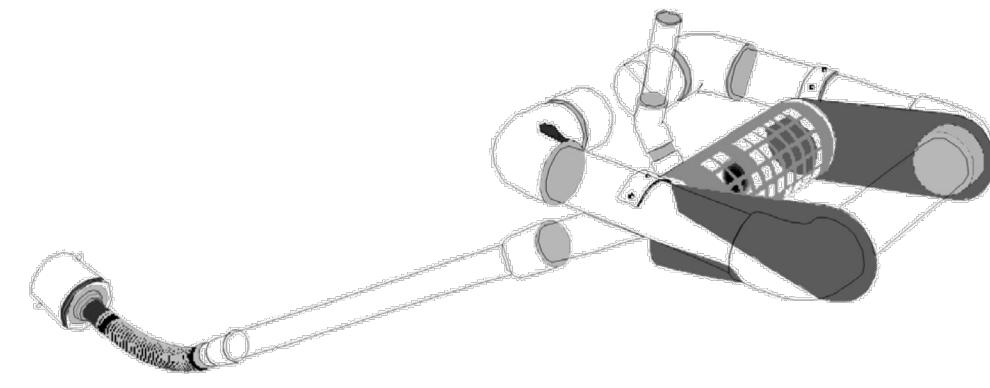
Outlet structure for a temporary sediment basin - Faircloth Skimmer Floating Outlet. Illustration courtesy of J. W. Faircloth & Sons, Inc., FairclothSkimmer.com.
